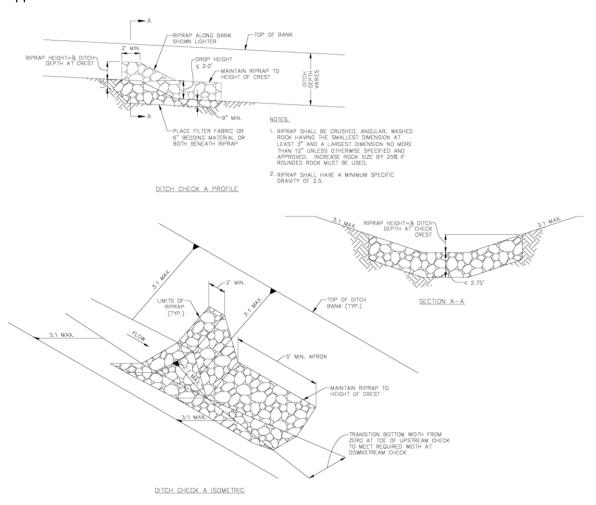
Schematic Roadside Ditch Check Structure.
